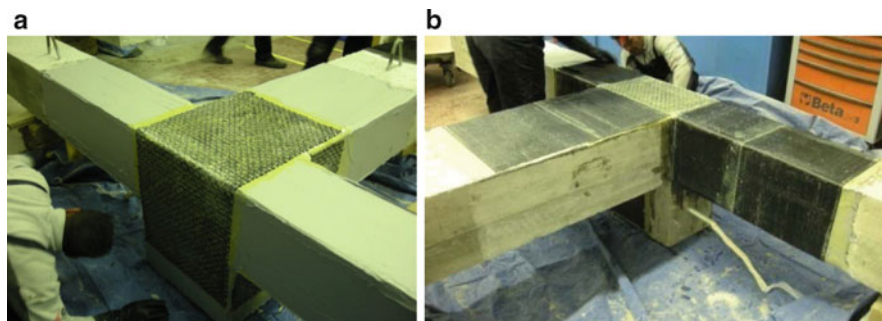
(a) Joint panel strengthening; (b) column and beam strengthening
